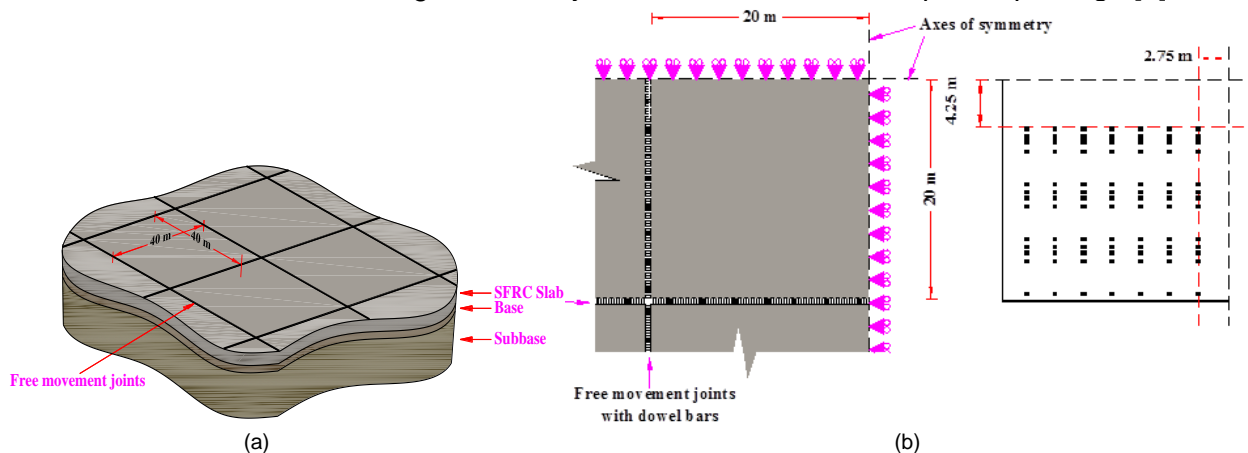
(a) Industrial ground slab and the foundation layers; (b) Modelling details and configuration of racking bases
